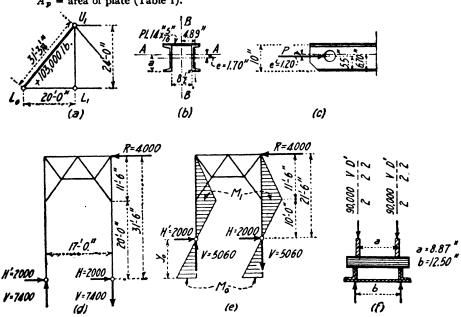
END-POST OF A HIGHWAY BRIDGE.
